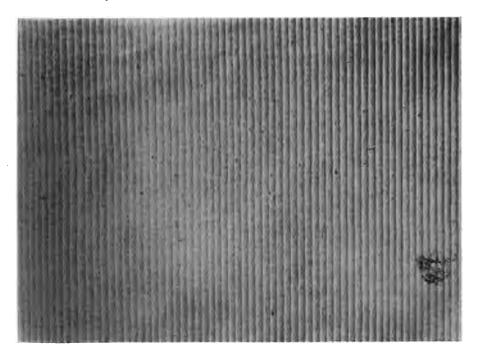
SURFACE MANUFACTURED STONE TOOLED BY MACHINERY.
